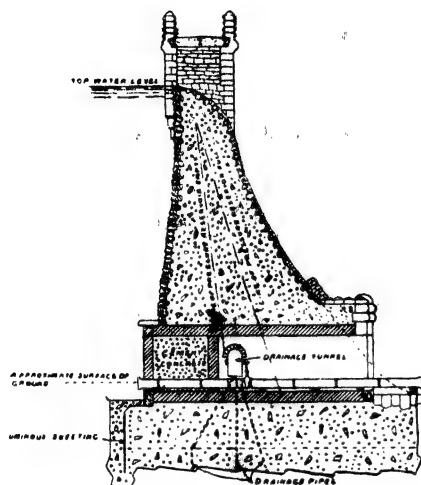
Cross Section of Jharria Dam through outlet culvert.
